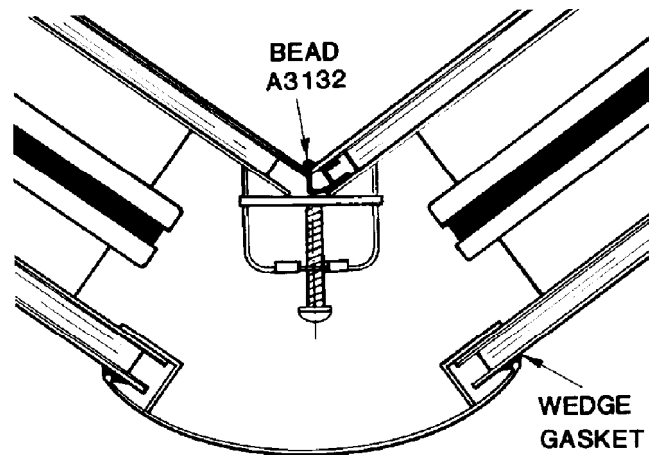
CLIP ASSEMBLY AND WEDGE GASKET
